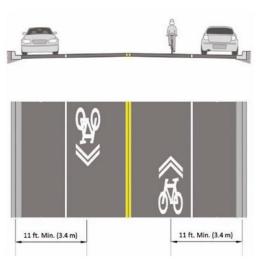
Typical Shared-Lane Marking Cross Section on Street with Parking
